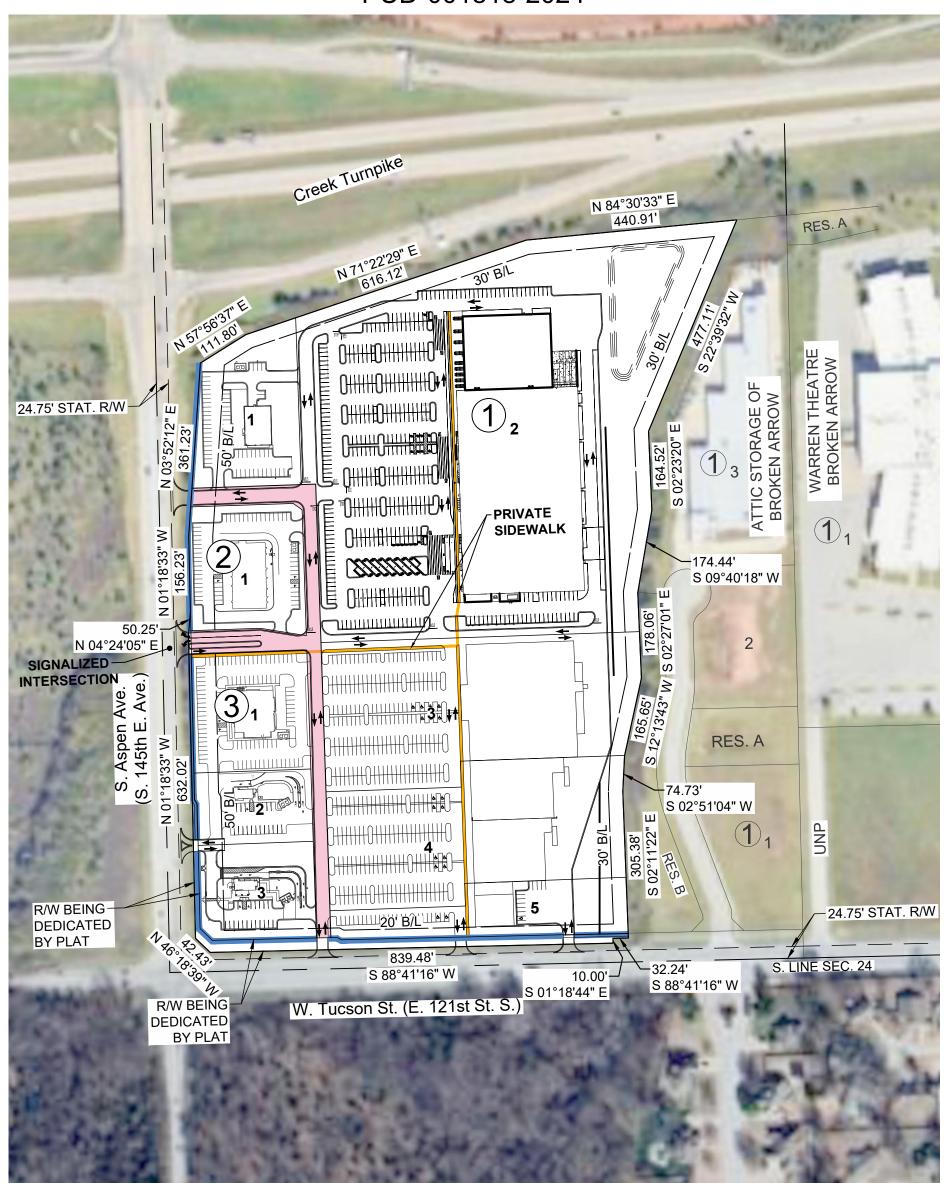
EXHIBIT 'F'CONCEPTUAL ACCESS & CIRCULATION PLAN
